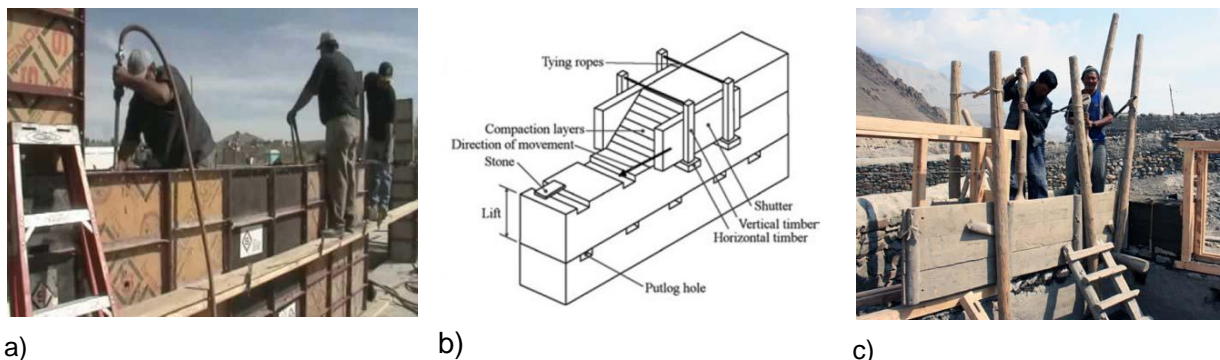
c)Traditional and a)modern rammed earth building technique; b)crawling formwork
